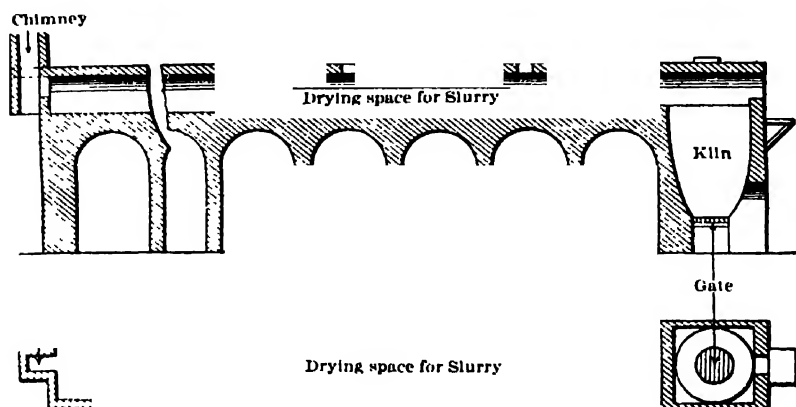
Section through a Johnson kiln (chamber kiln with drying floors for slurry).
